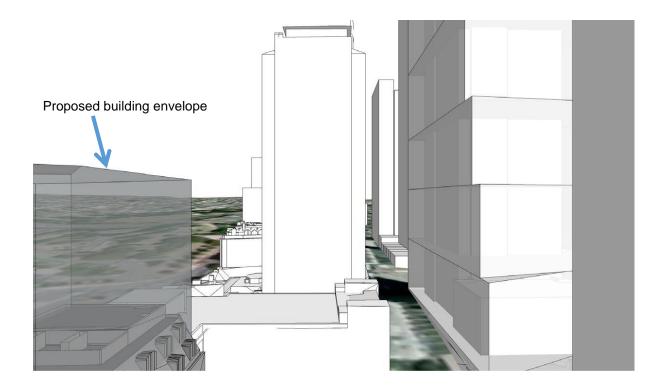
Proposed building envelope as viewed facing south from a typical mid-rise apartment within The Quay
